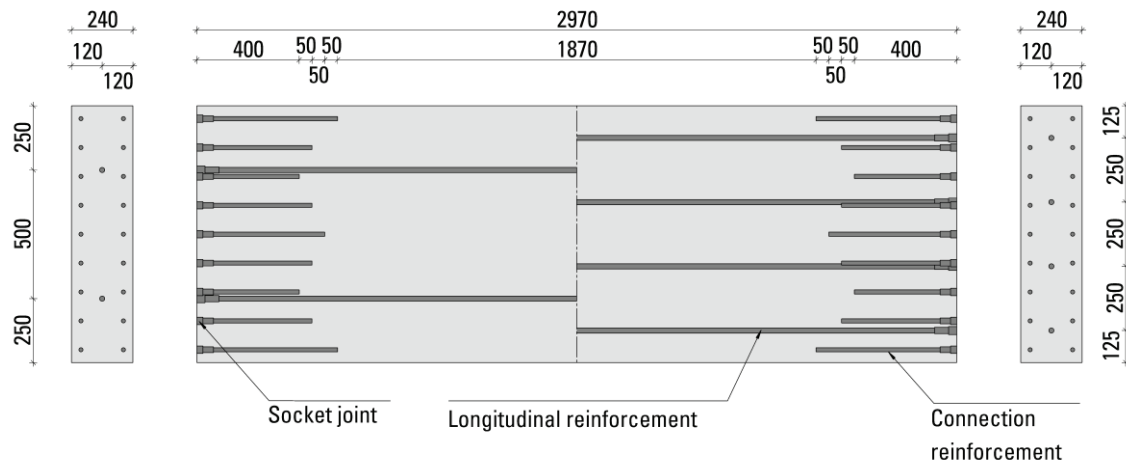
Specimen geometry and reinforcement layouts for the single-layer reinforced specimens of test series 2
